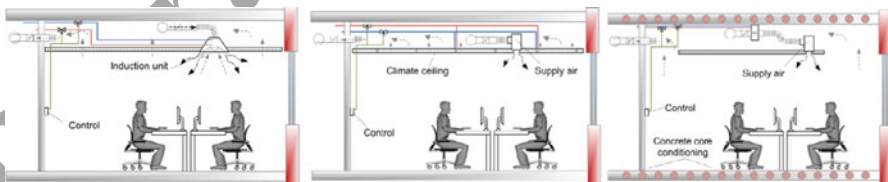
Active ceiling induction units, climate ceiling, and concrete core activation
